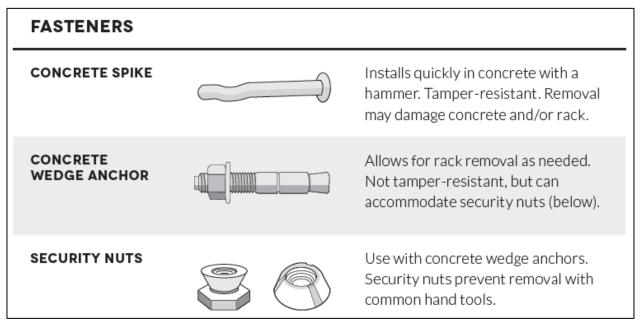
Examples of concrete fasteners (from APBP Essentials of Bike Parking, page 8, <u>www.apbp.org</u>, used with permission from the copyright holder)
